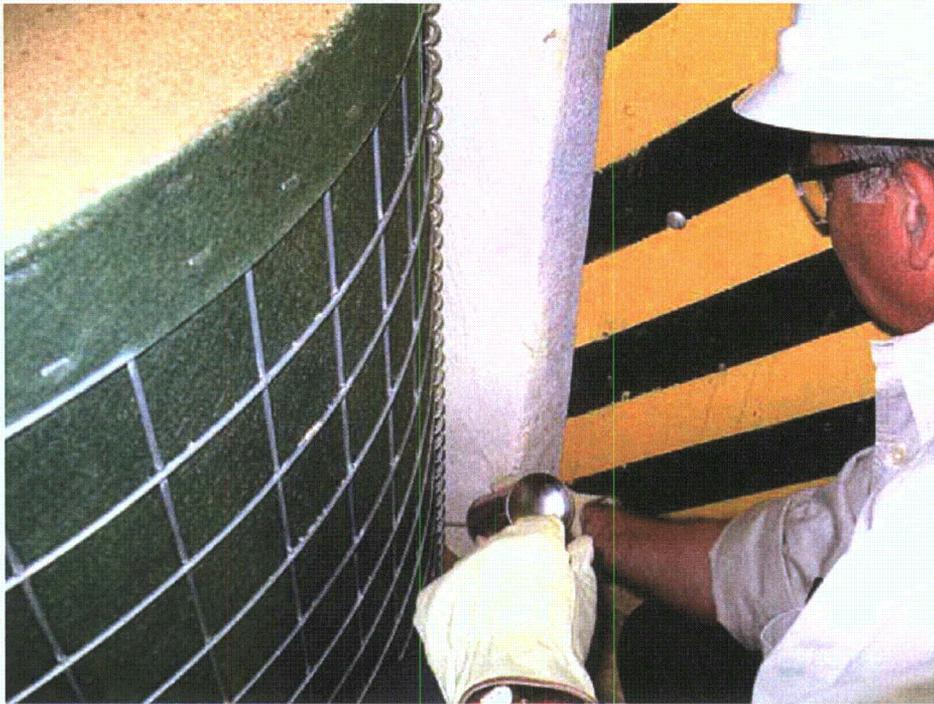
Sealing concrete wall abutment with aerosol foam
